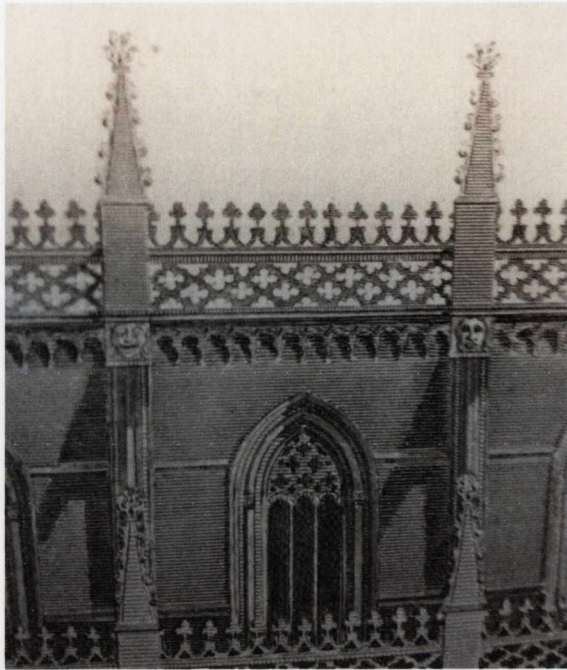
'The north elevation of the church of Batalha' showing cresting, frieze and cornicing details from Murphy, *Plans, elevations, sections, and views of the church of Batalha* (1795).
